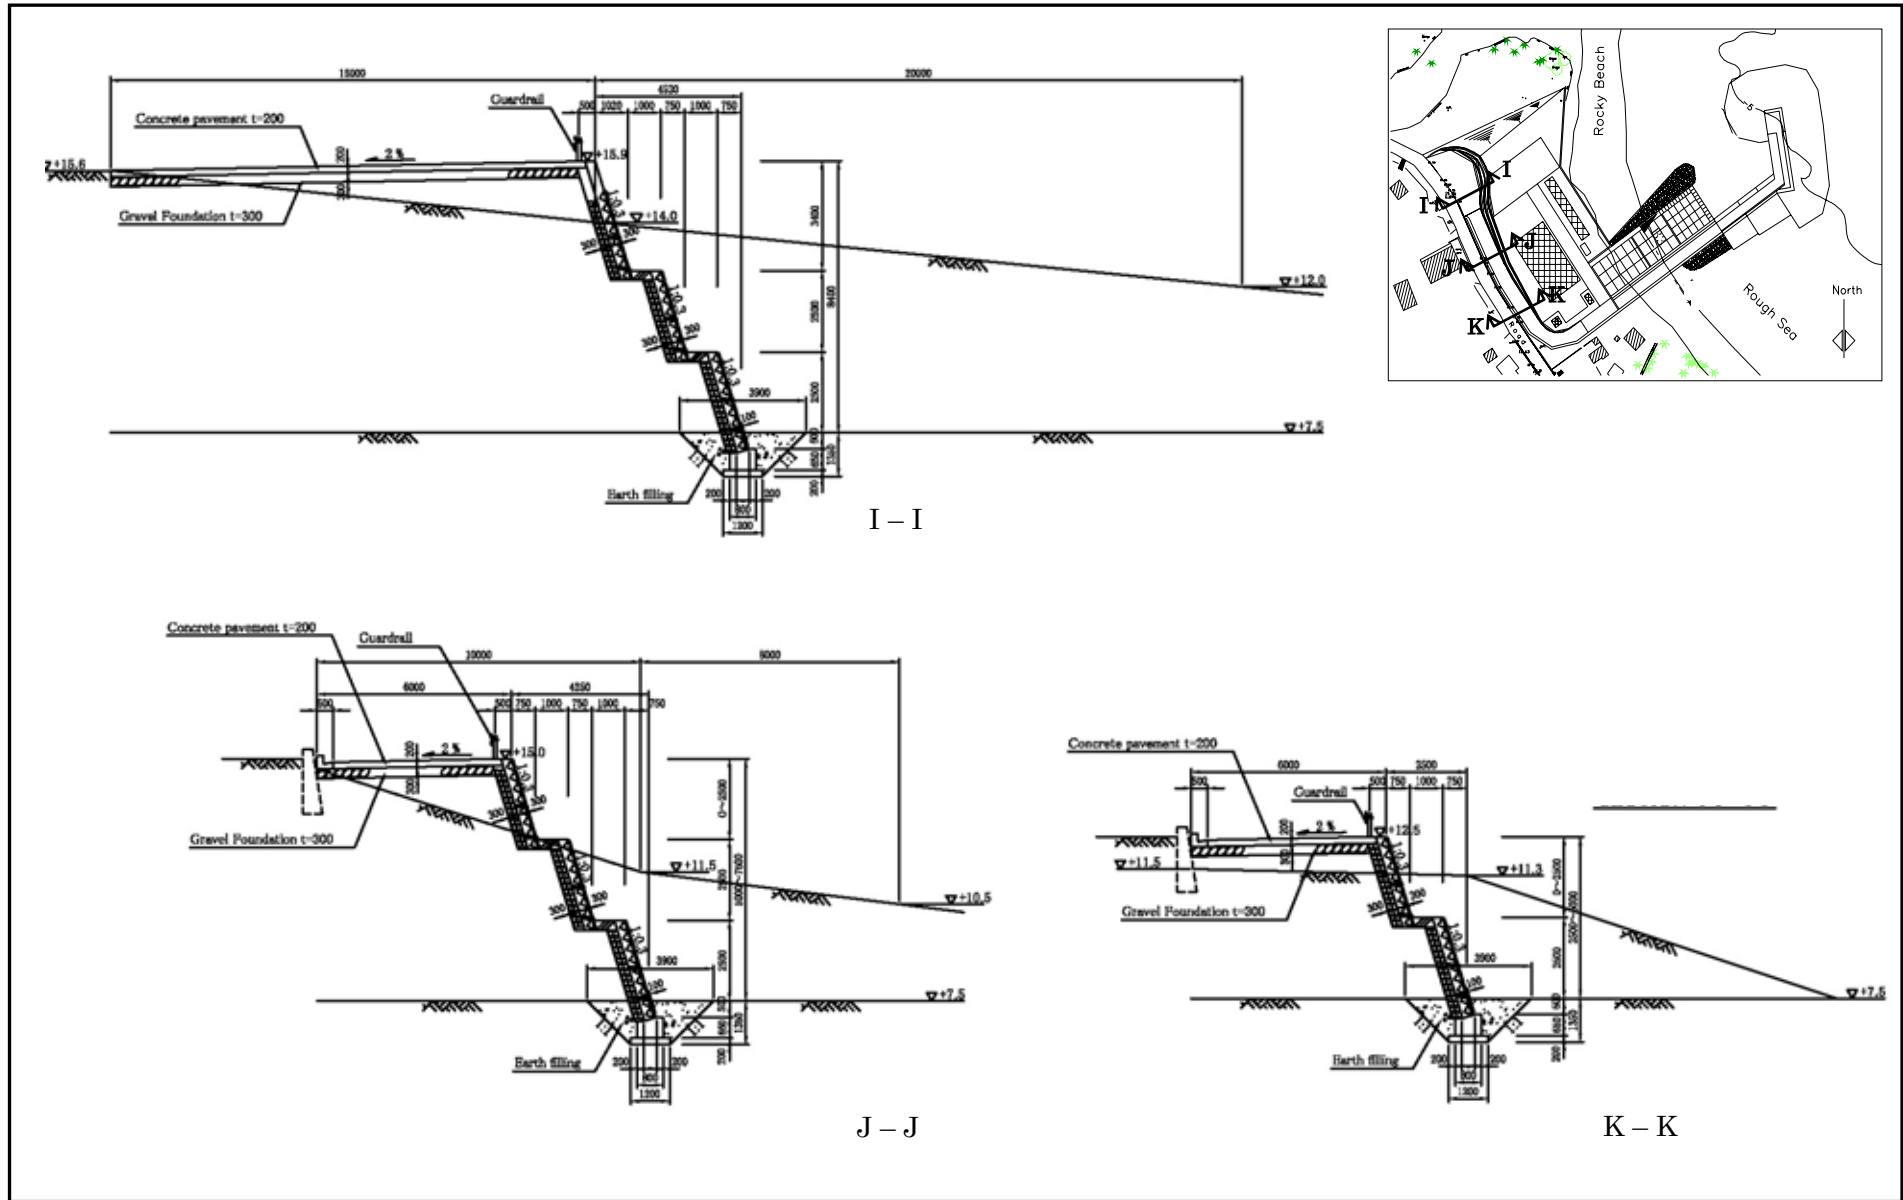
(10) Cross Section for Site Passway (Section I-I, J-J, K-K)
